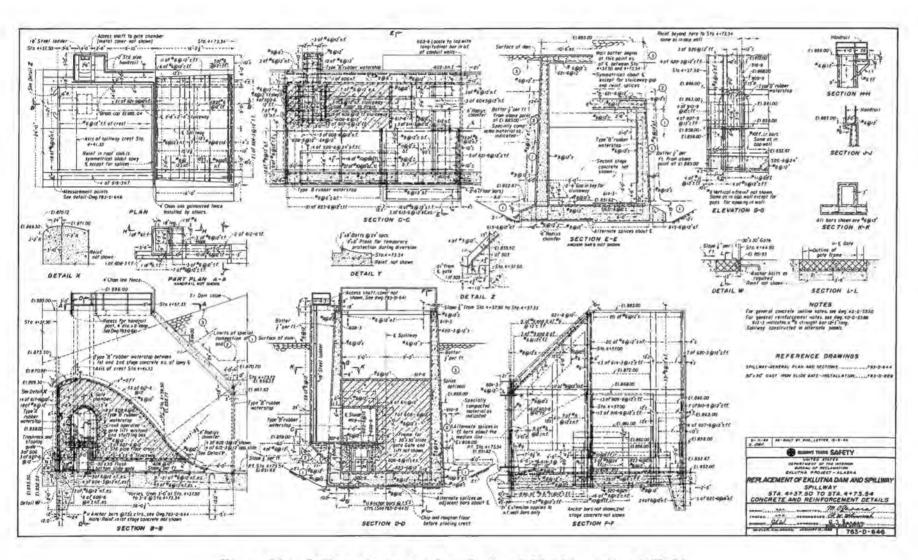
Spillway design details -- Station 4+37, 50 to station 4+73, 54.
